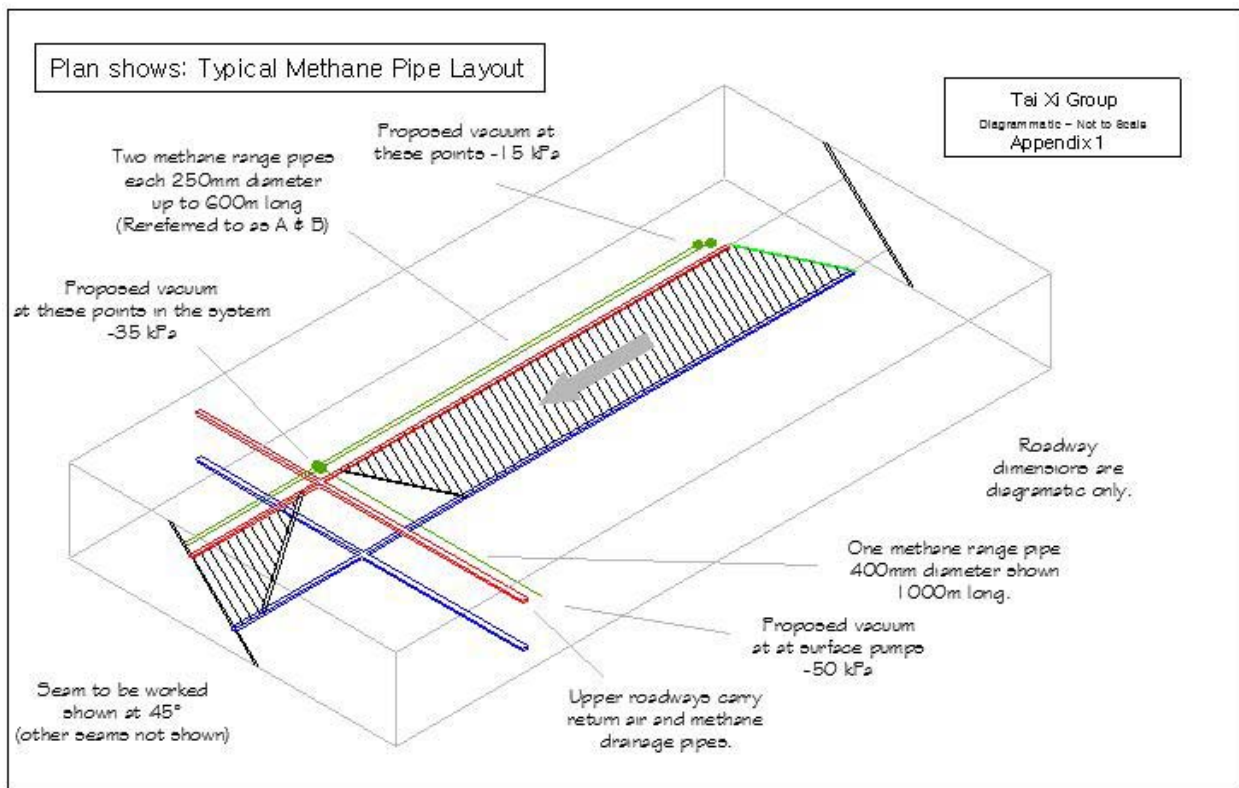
Methane Pipe Layout for a Typical Shortwall Panel
